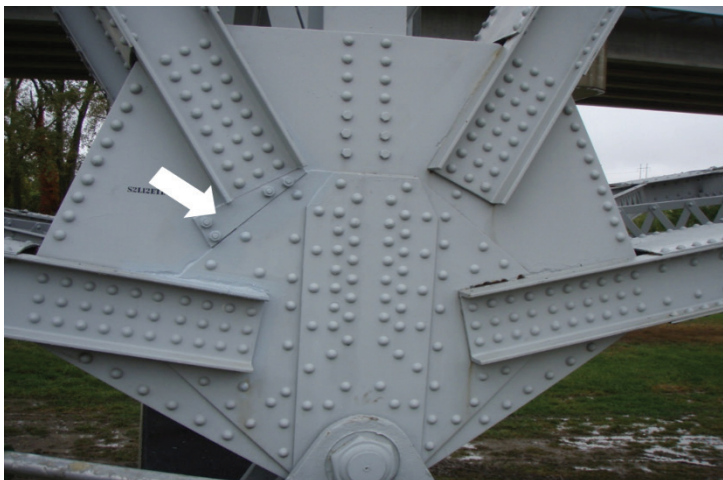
Plate repair (arrow) to address severe section loss below a compression diagonal
